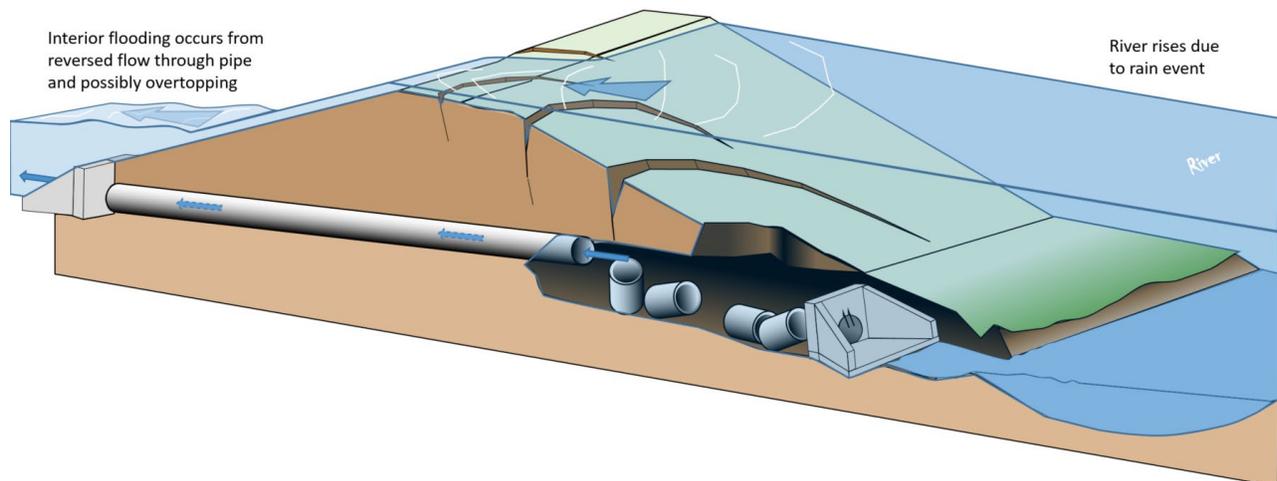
A lack of outlet control and lowered crest allow interior flooding.
